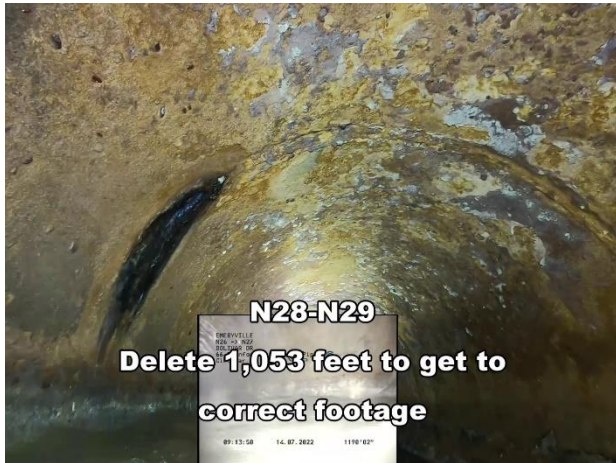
Typical VANDA Level 3 with yellowish concrete/exposed aggregate; N26N271 shown with infiltration at joint
